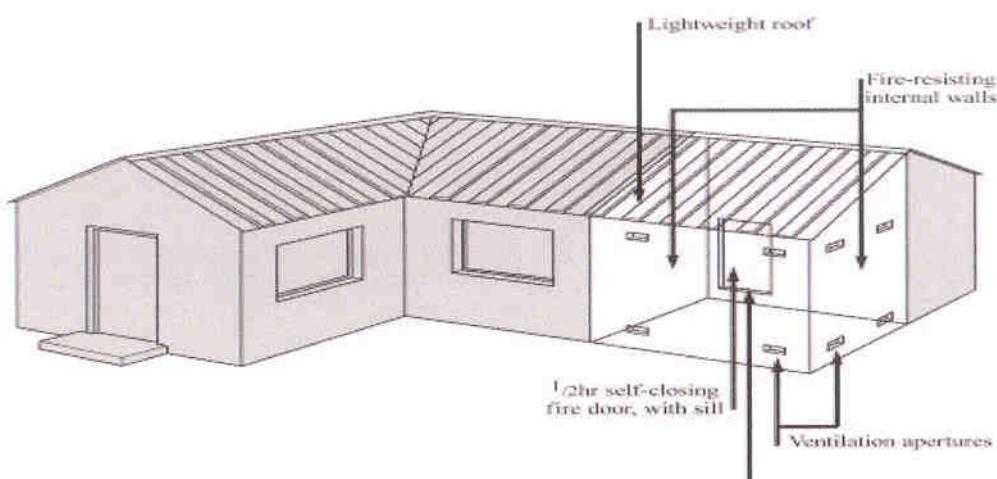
An example of a suitable storeroom in a building. In the case of a multi-storey, advice should be sought from the relevant enforcing authority.
